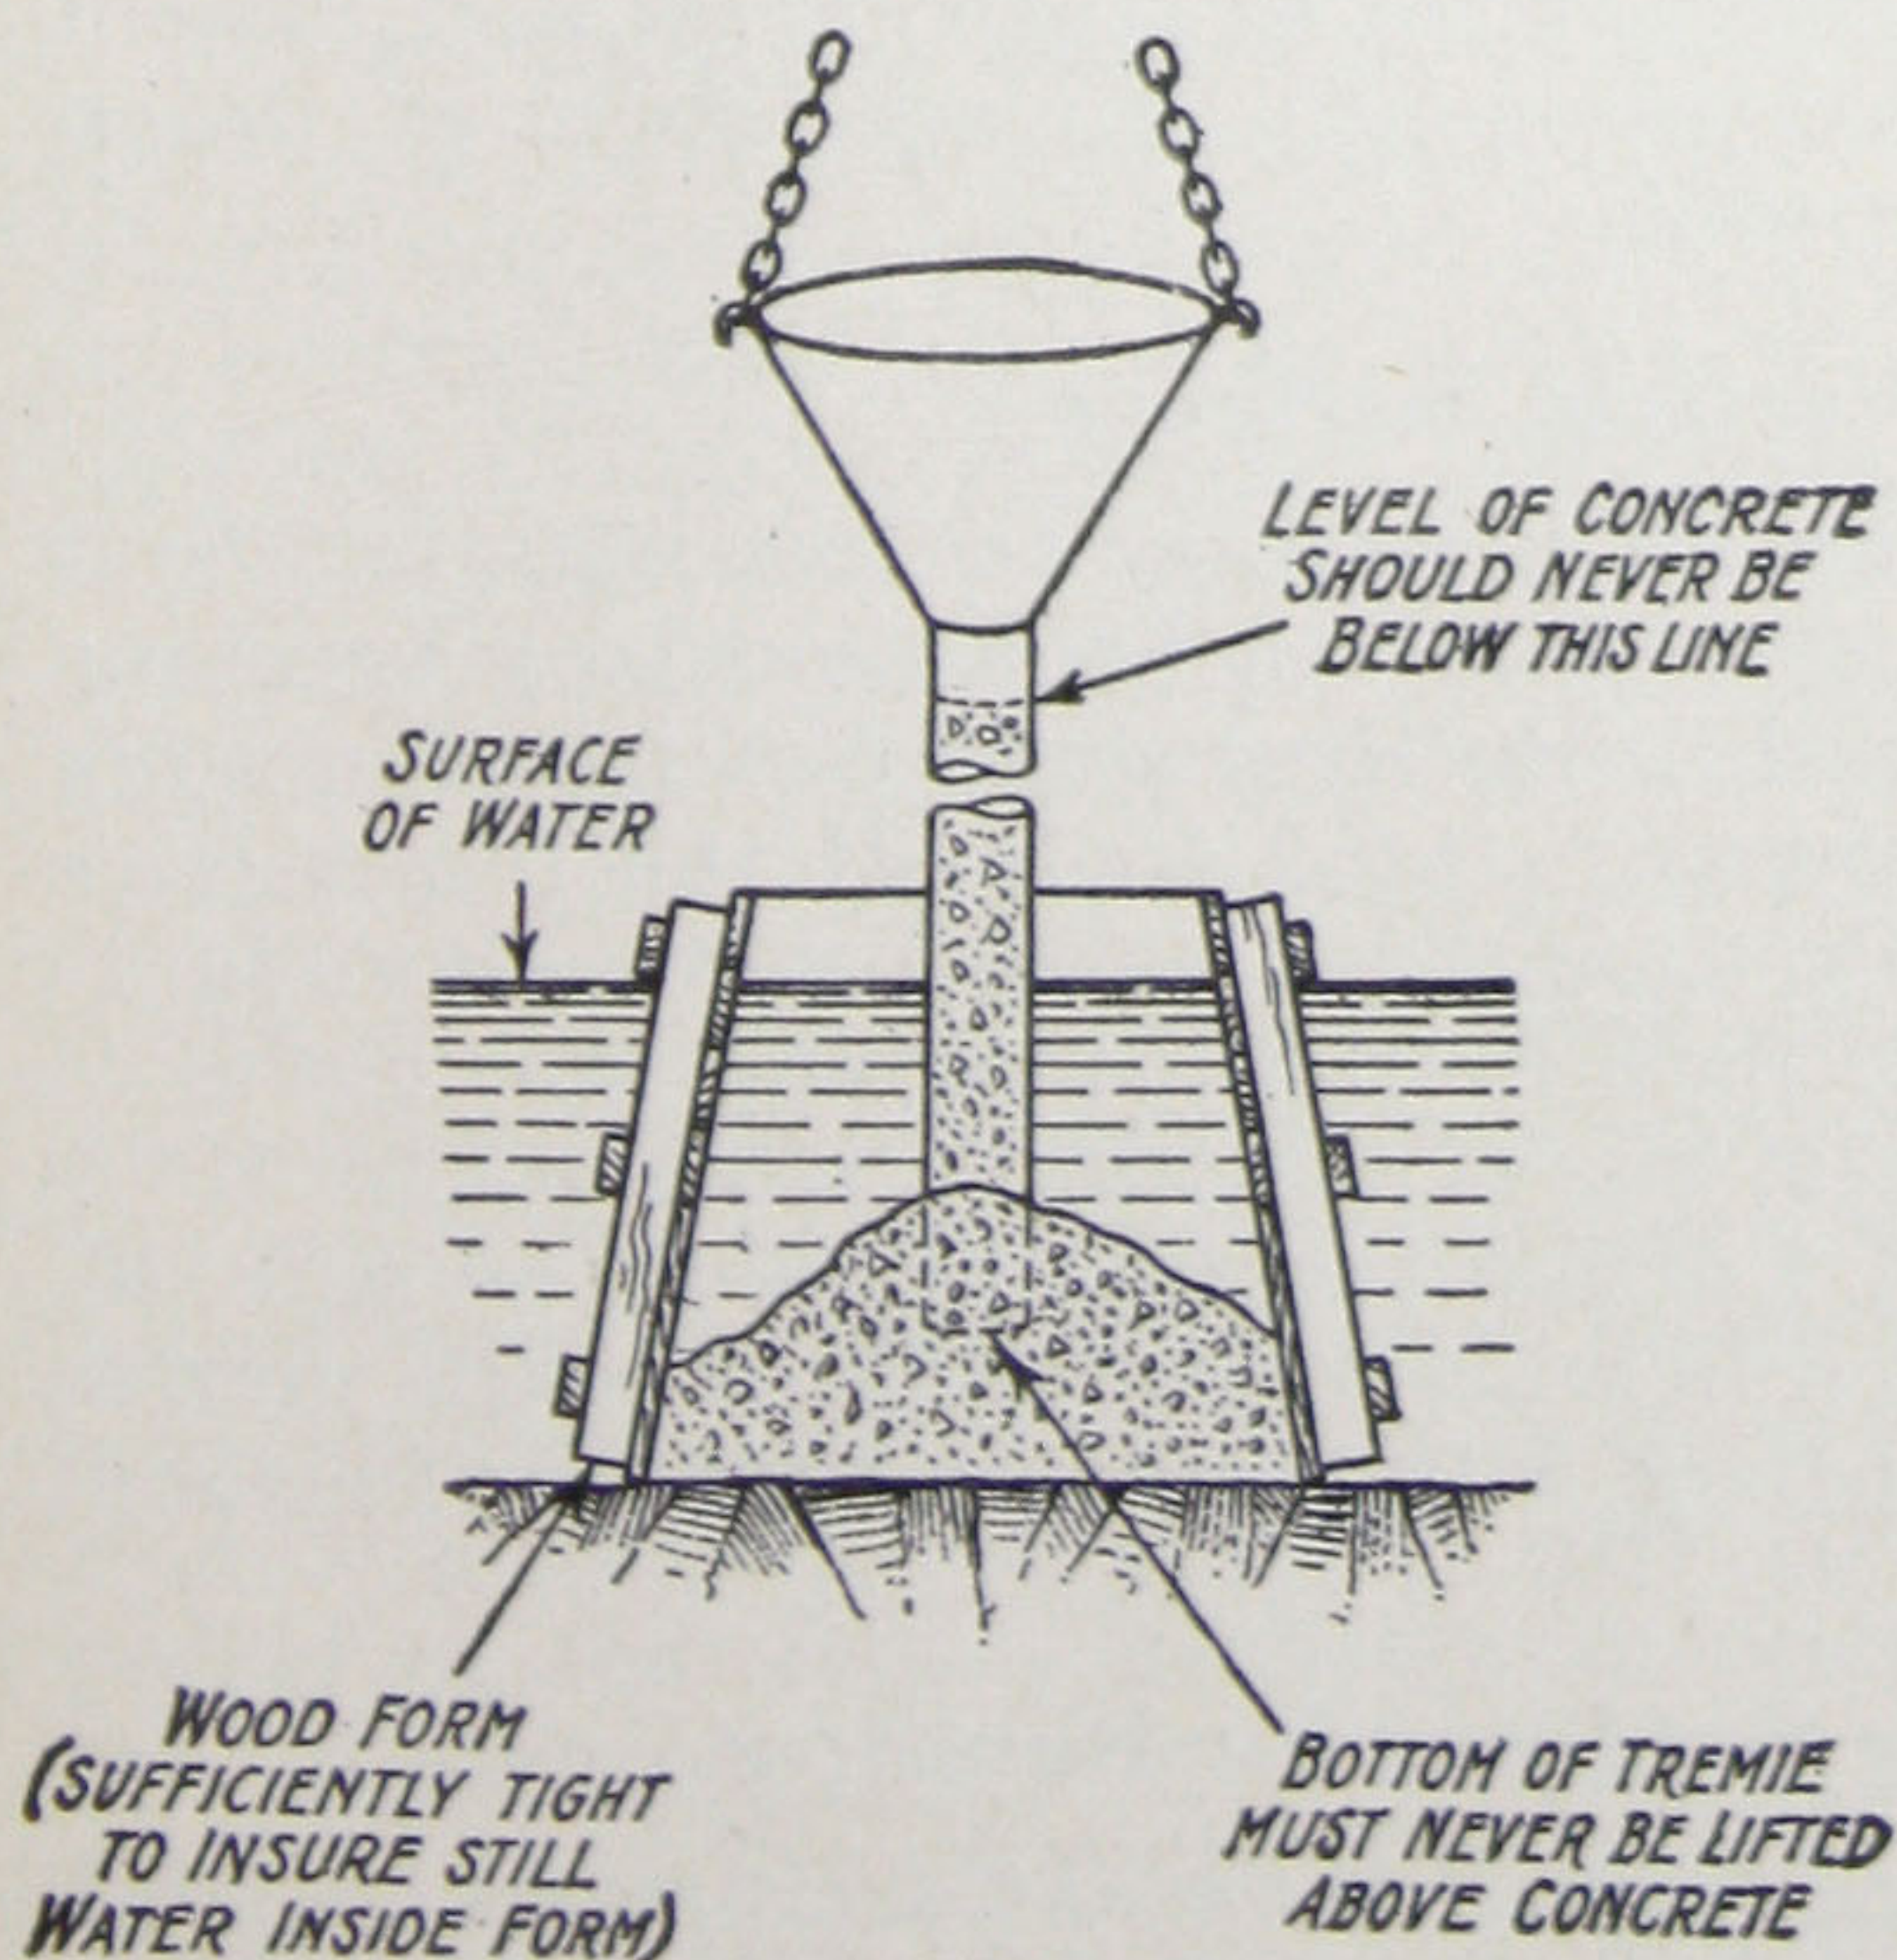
Depositing concrete under water by means of a pipe or "tremie." Details of this illustration need not be followed exactly but can be adapted to each particular class of work.
